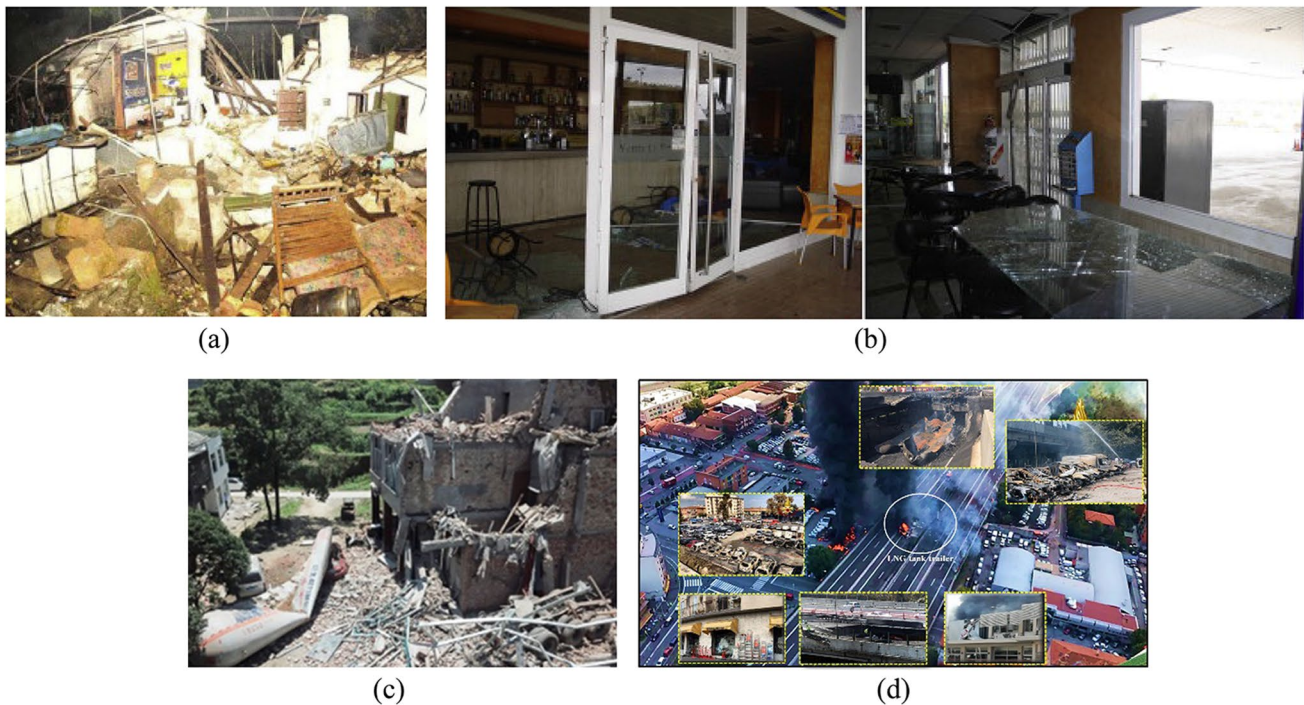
Photograph (a) of a heavily damaged house; (b) of a damaged shop; (c) of a damaged building, and (d) of a demolished road after the accident of a vehicle transporting a dangerous substance (BarihaaIndr et al. 2016; Planas et al. 2015; Lyu et al. 2022; Wang et al. 2022)
